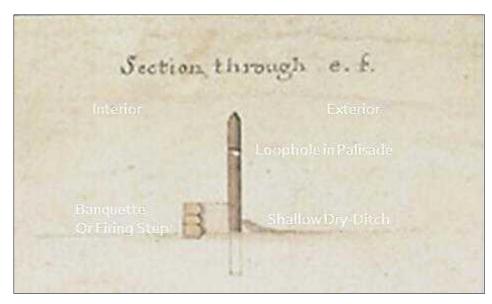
Detail of Plan of Fort Erie, *Built under the Direction of John Montressor, Engineer, 1764*. By Francis Pfister, 1766 showing details of perimeter.
